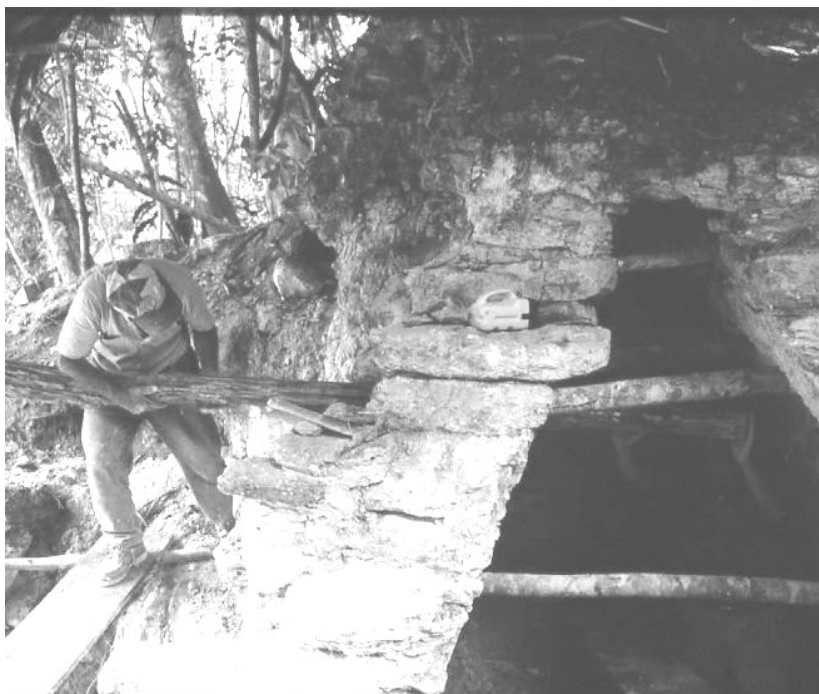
Consolidation work on Structure EP25 at El Pilar. The worker is installing replacement vault beams, note the meter long stone covering the entire wall top in the lower left foreground.
